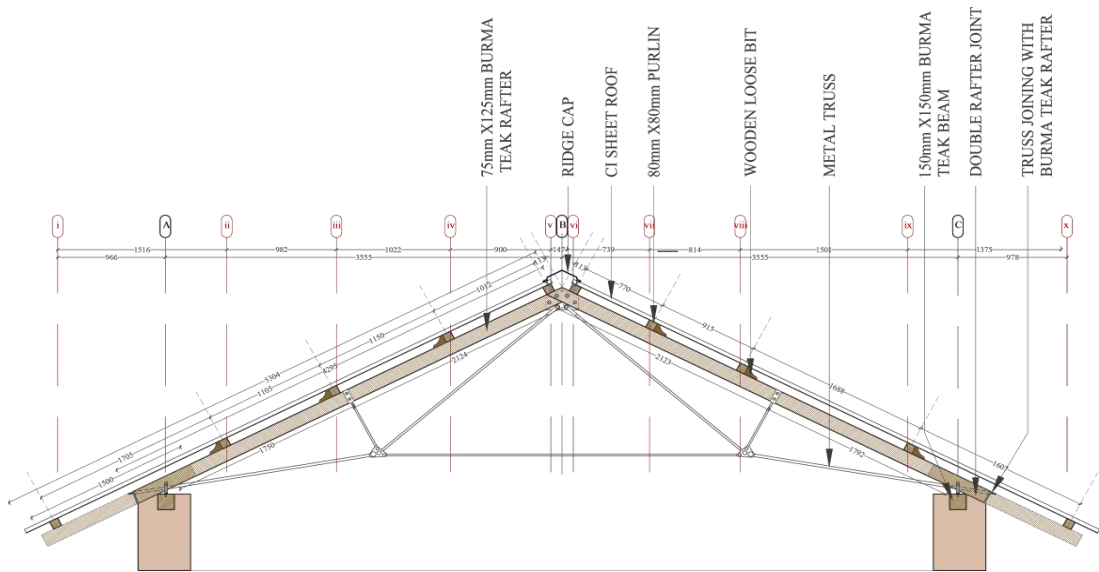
Drawing of Rafter- purlin Joint Detail of CC-05
